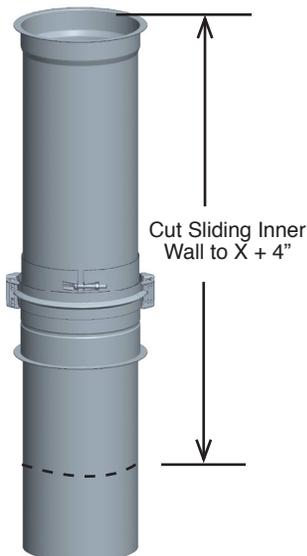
Step 2 - Cut of the Sliding Inner Wall
